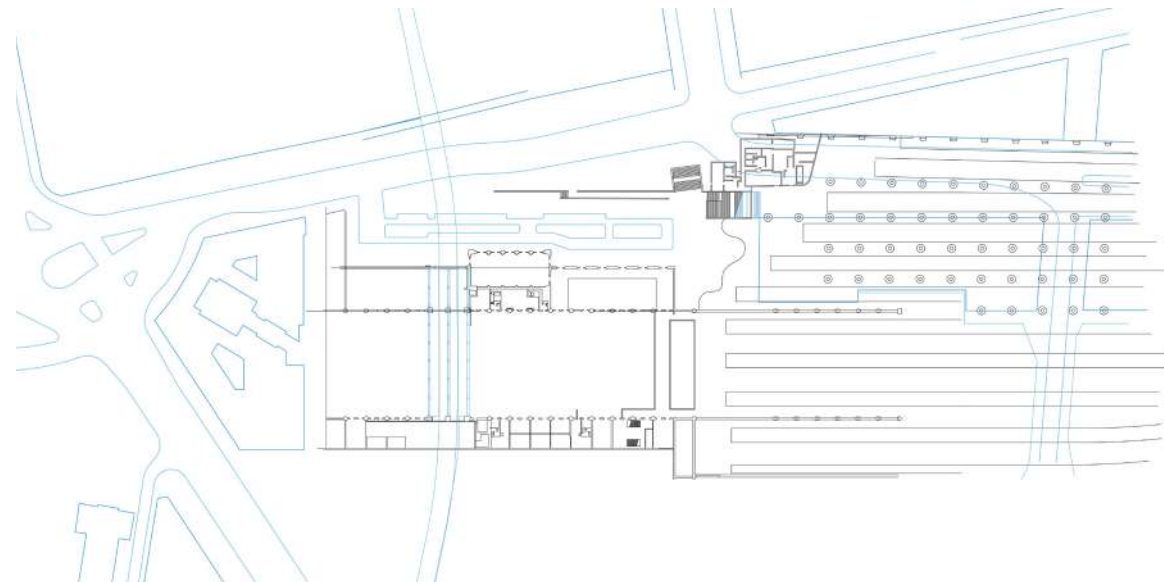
Schematic plan of the ground floor of Gare d'Austerlitz
